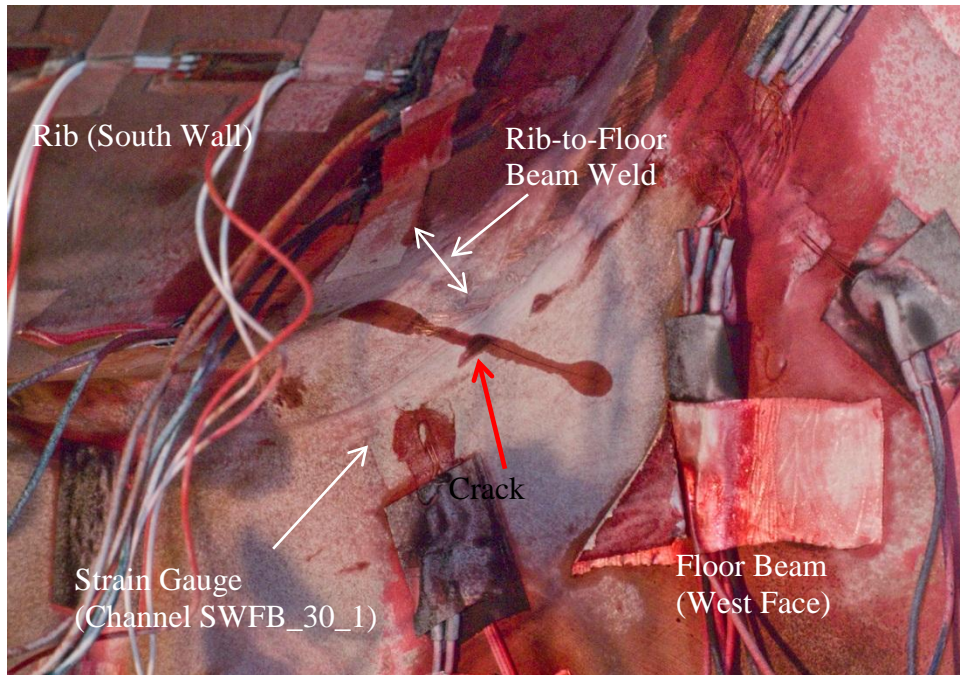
Crack at the floor beam-to-rib welded connection in the mock-up specimen MU2 – south west
